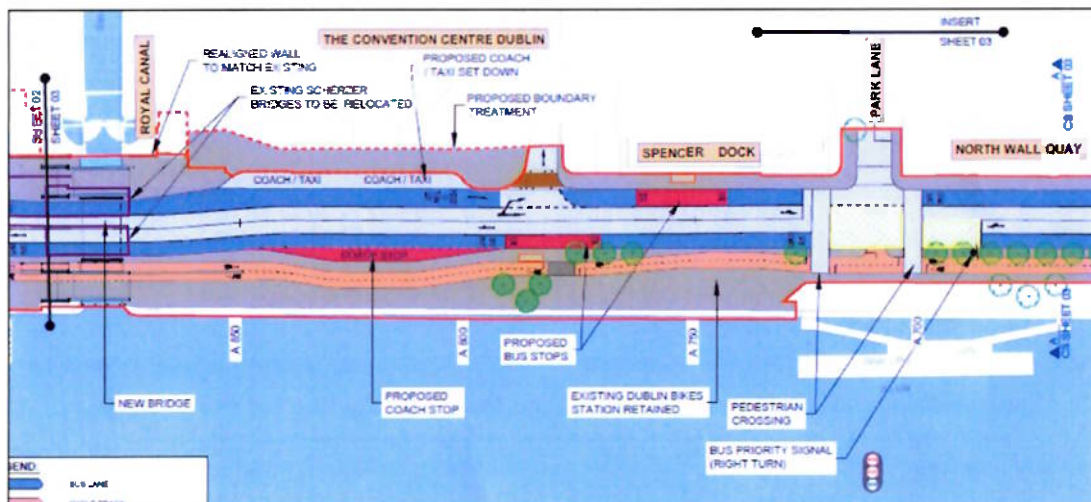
Extract from General Arrangement Drawing Sheet 3 Part 1 North
